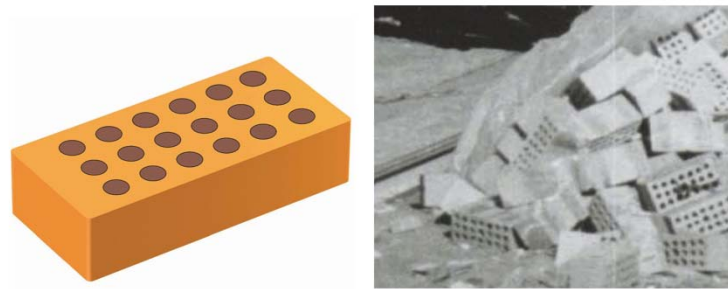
Hollow clay brick used for infill panels and photo of coeval school construction site.
